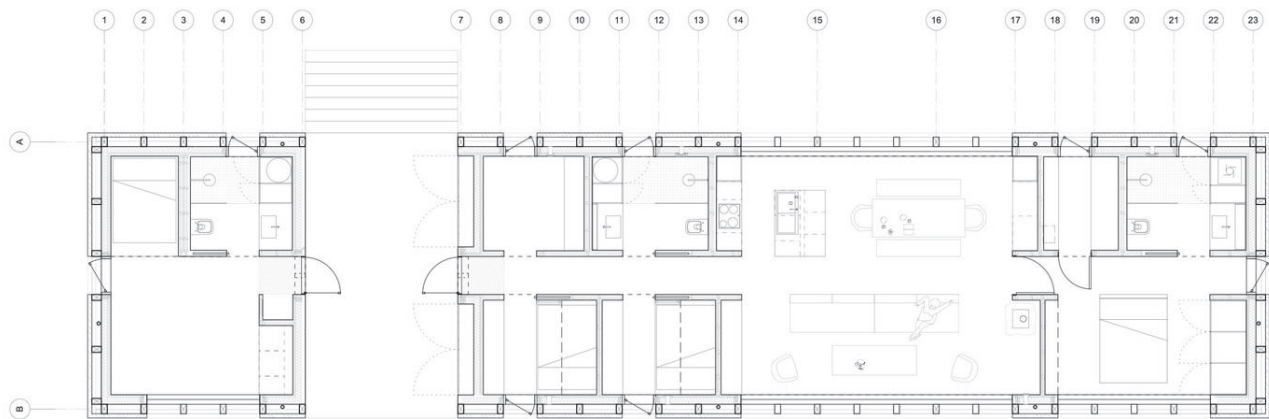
| FLOOR PLAN, PHOTO CREDIT | ARCH DAILY
